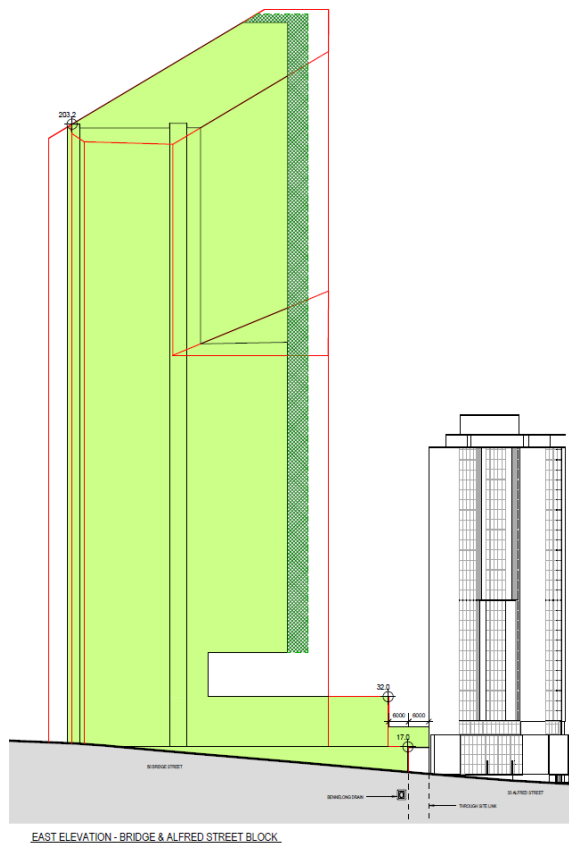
Stage 1 consent – building envelopes – Bridge and Alfred Street block
